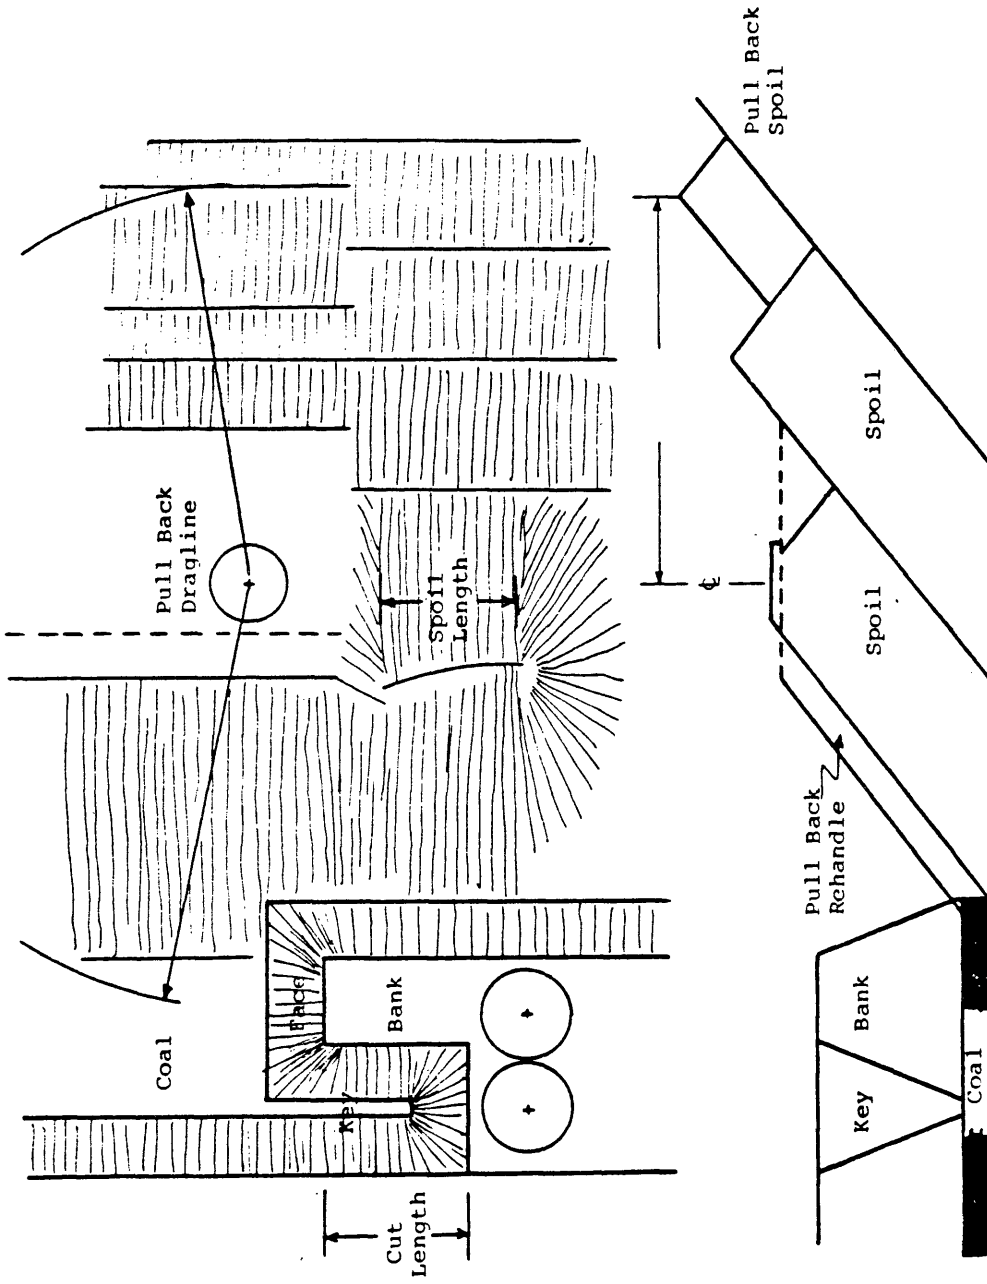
Plan and Cross Sectional View of the Pull Back Machine Operation.
